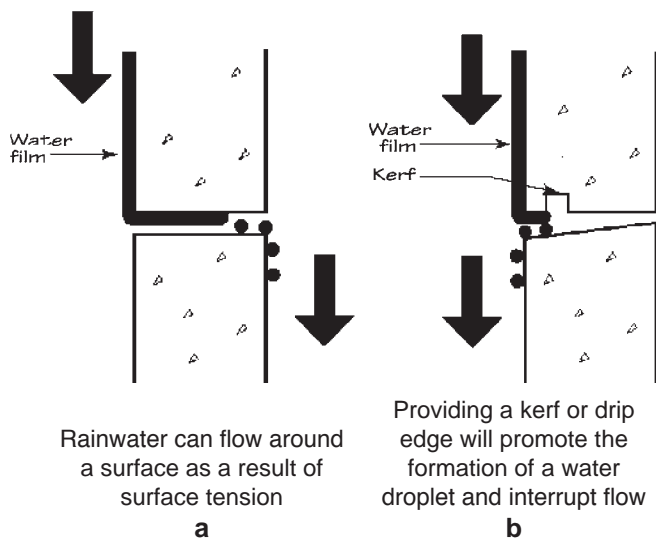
a and b. Flashing to eliminate water penetration around an edge. Some crucial flashing details and kerfs should be made to ensure droplet formation and drainage to the exterior.
